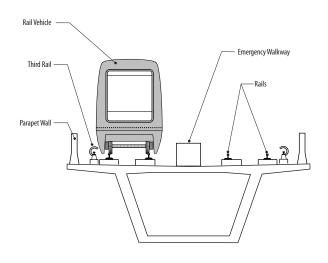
Example Vehicle on Elevated Guideway (Cross-section)
